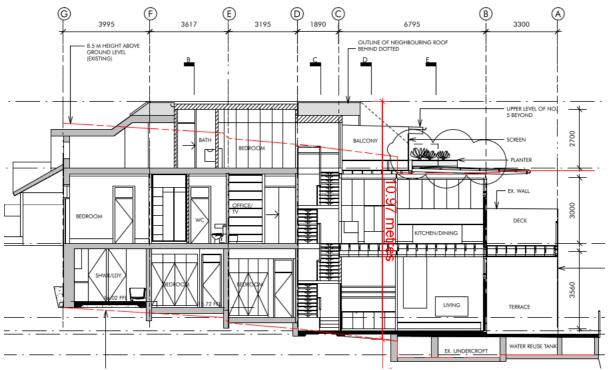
Extract from Section AA (Drawing No. A 303) depicting building height.
